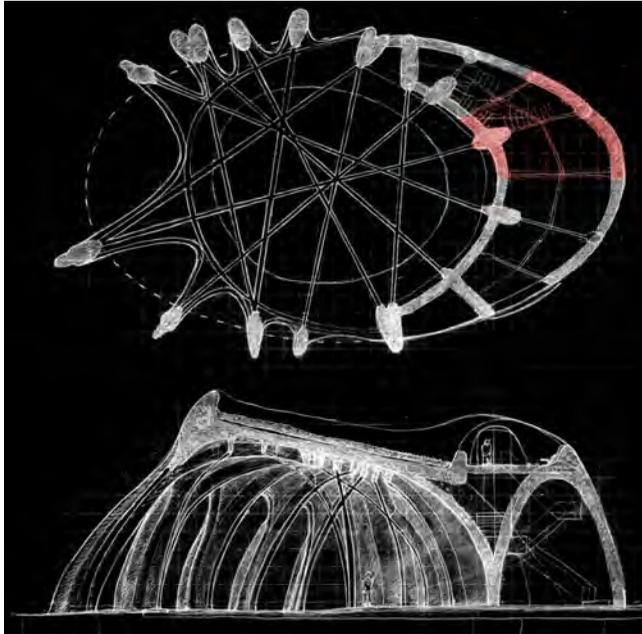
Plan of building design. The part of the building developed in this project's Exquisite Corpse in red.
